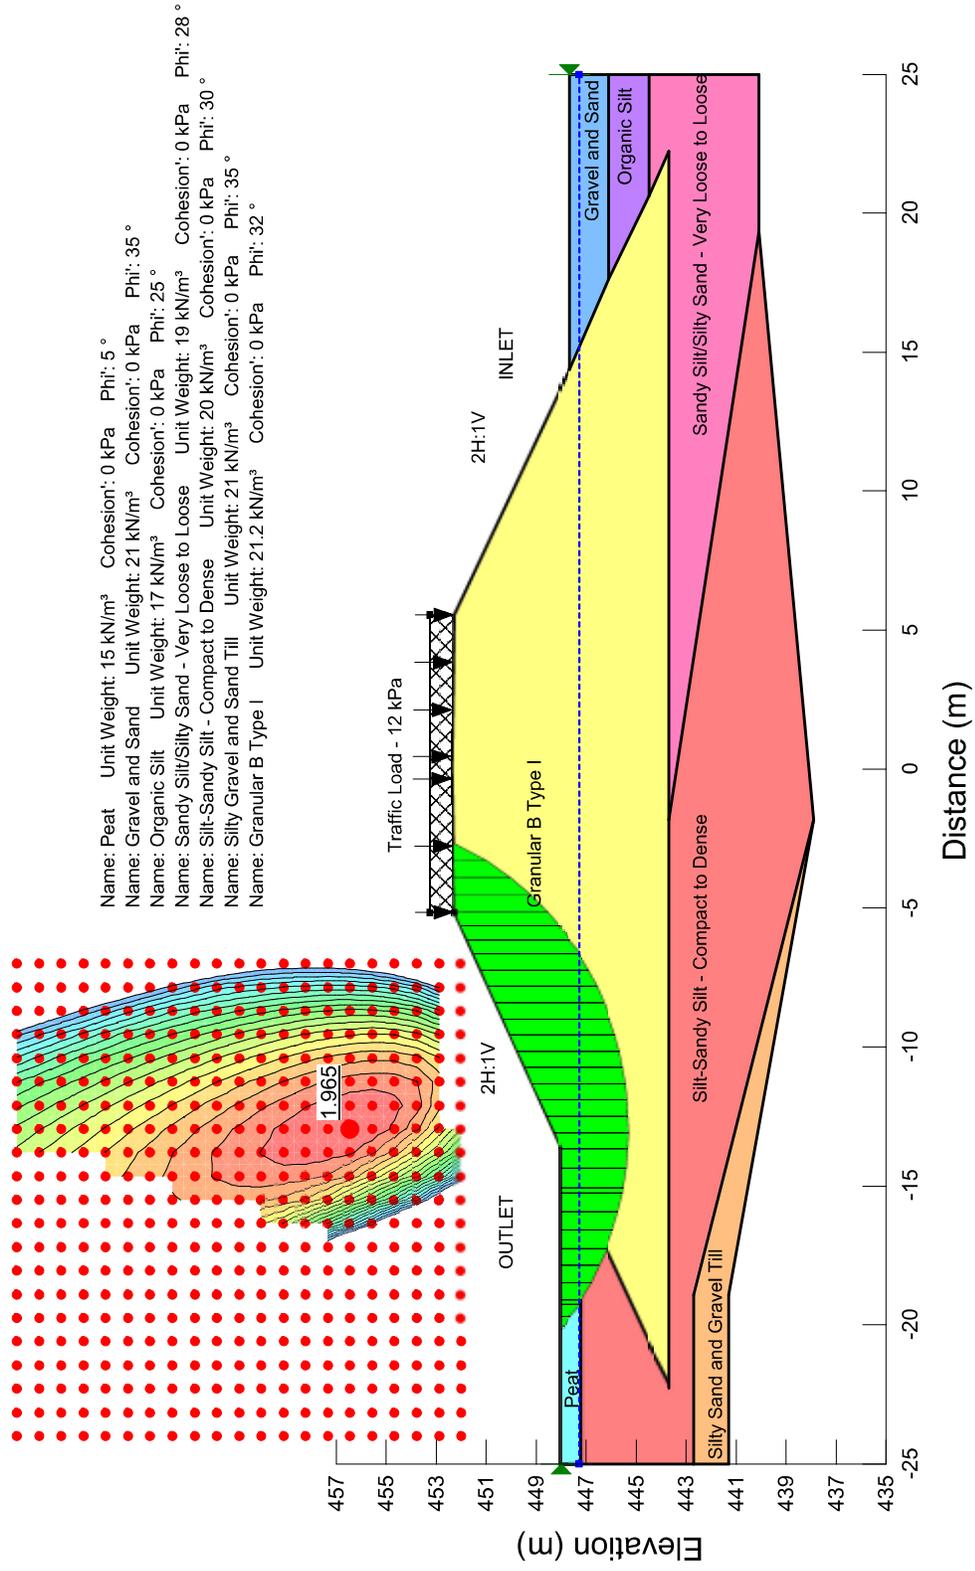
Proposed Embankment Stability - Outlet Side
